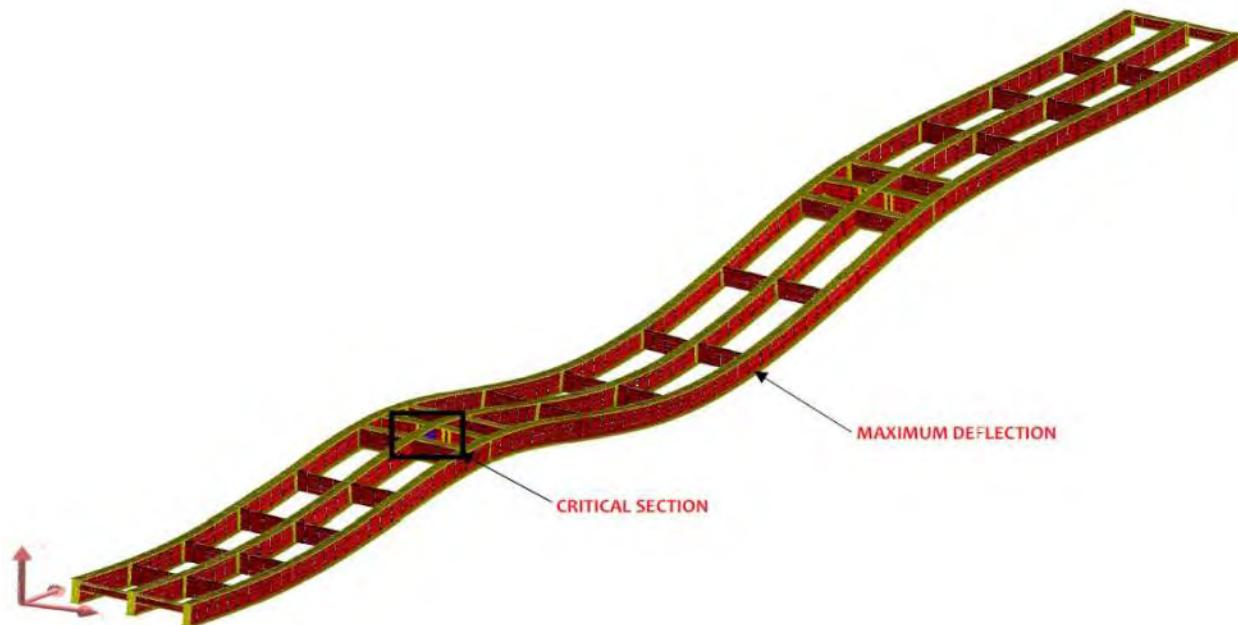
Deformed shape of structure at 4.1 x HL-93 loading (Deck not shown for clarity)
